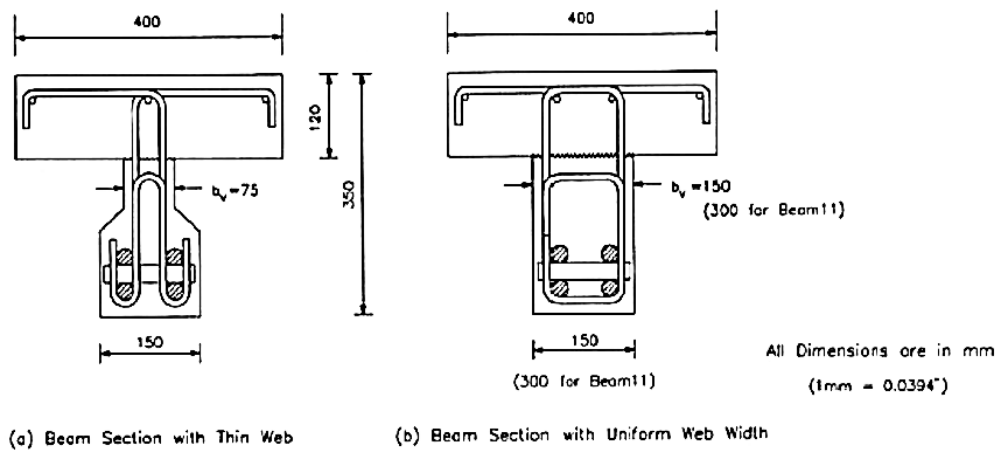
Typical cross-section of test beams (Loov and Patnaik, 1994)
